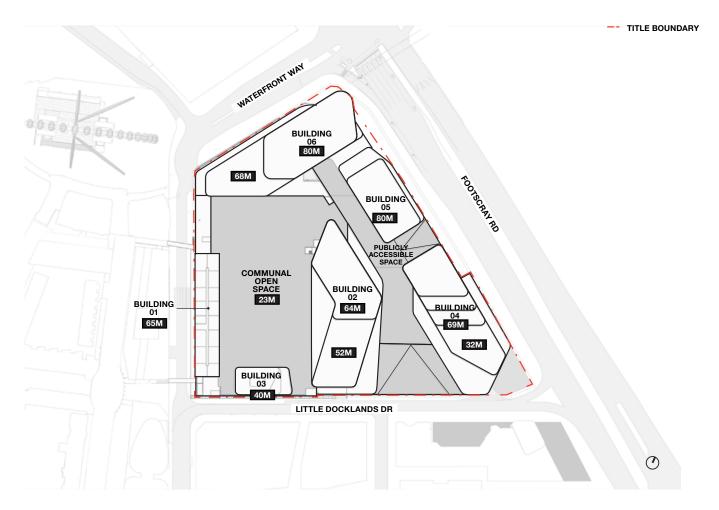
Concept Plan 8 - Maximum heights, Roof plan
